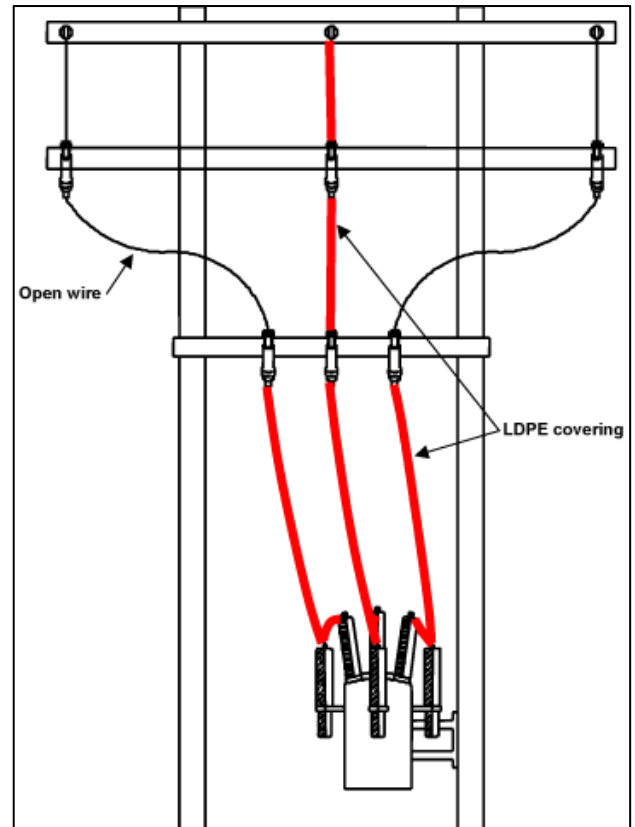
Example of use of Low Density Polyethylene (LDPE) pipe on jumpers to insulate selected live components of transformers and switch gears.
